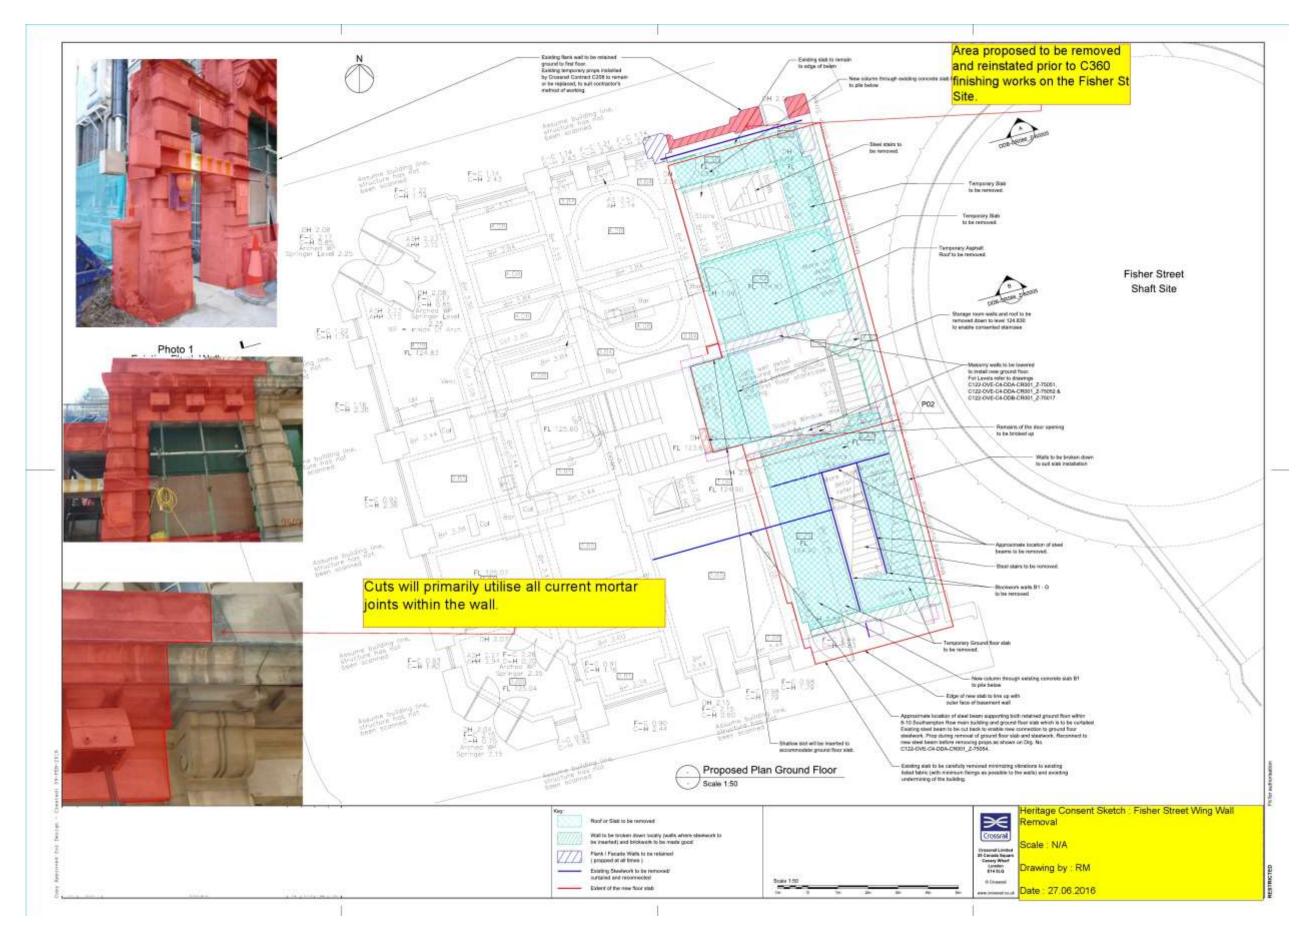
Existing Fisher Street Wing Wall showing the parts to be removed
